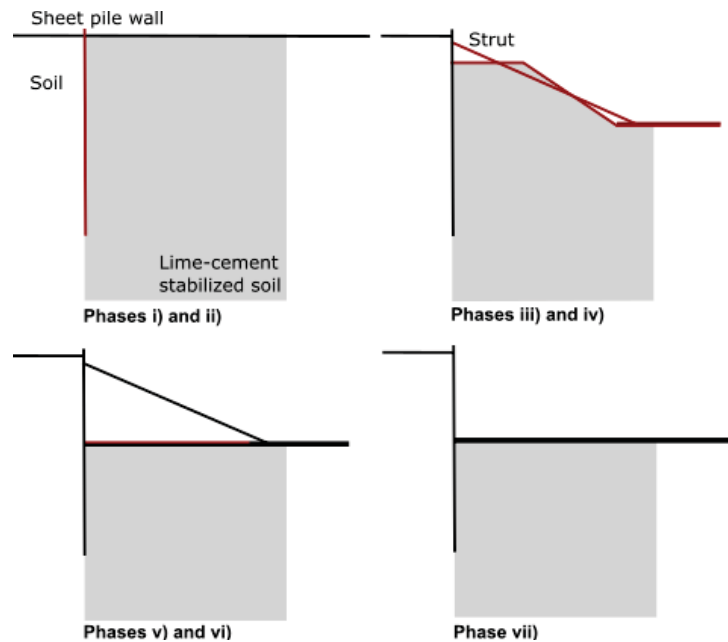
Construction sequence: i) SPW installation, ii) LC soil improvement, iii) excavation to final level, leaving a soil berm to support the SPW, iv) installation of struts and casting concrete slab, v) final excavation of berms, vi) extension of concrete slab to SPW, vii) strut removal.
